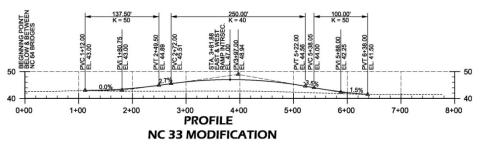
N.C. Highway 33 Plan and Profile- Segment 1
